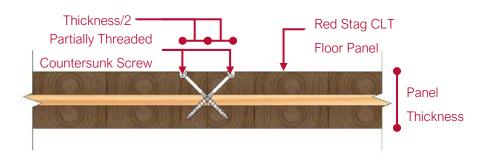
Red Stag three (3) layer CLT floor to floor butt joint connection.
